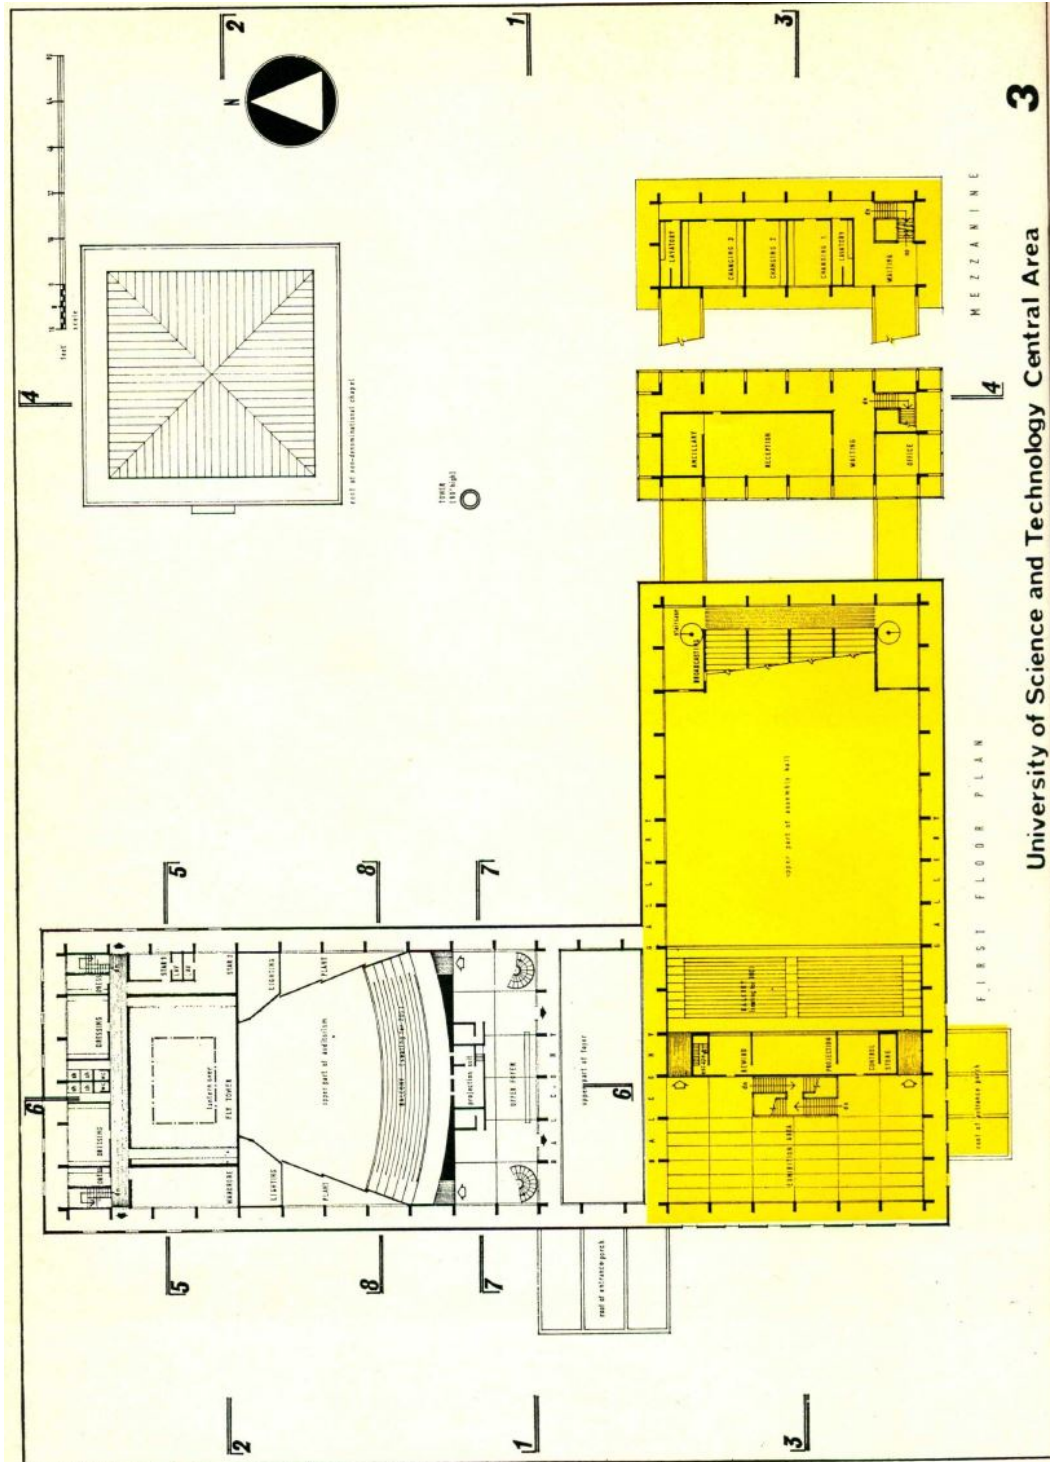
First Floor Plan of Great Hall, KNUST, and surrounding areas¹⁶⁶
